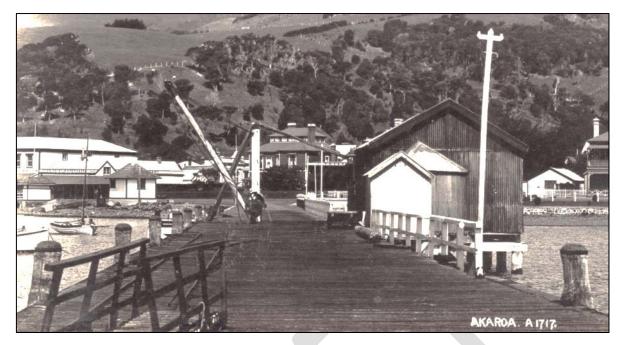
Brightened detail of a 1911 photograph showing the wharf decking (Kete Christchurch).
